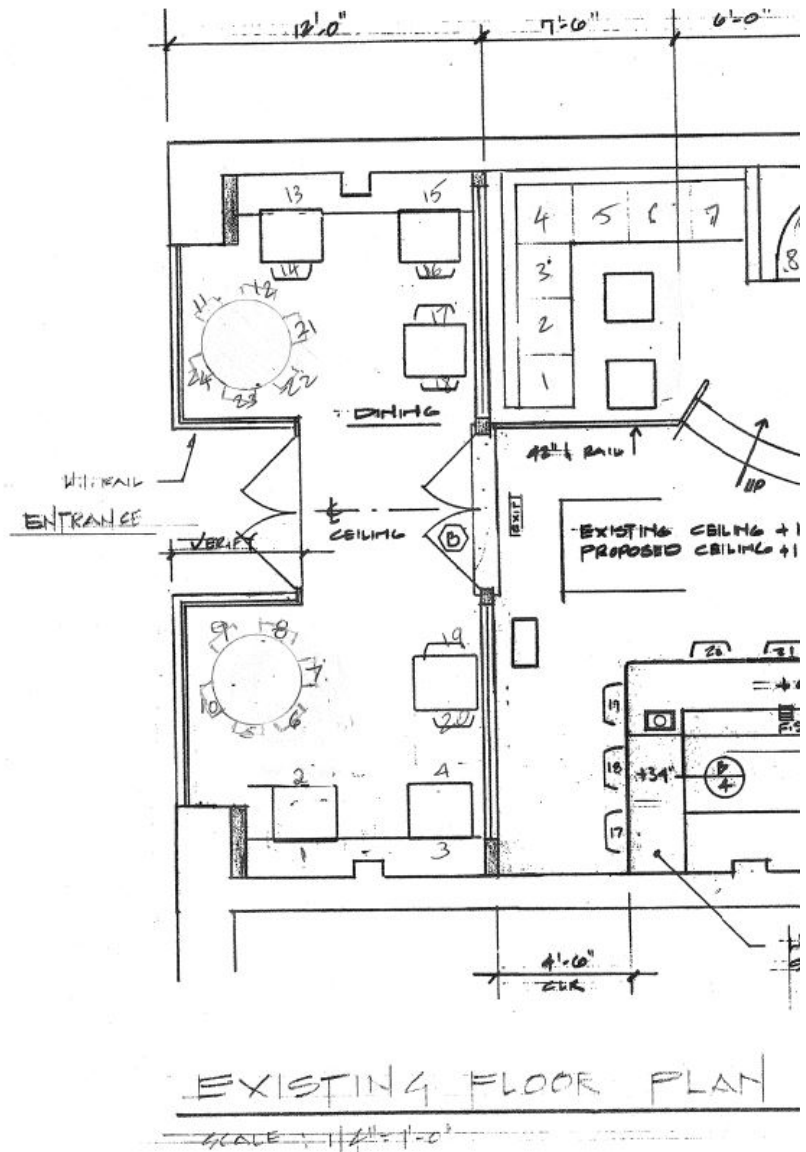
Partial section of Existing Floor Plan per MFR Report Attachment Plans.
